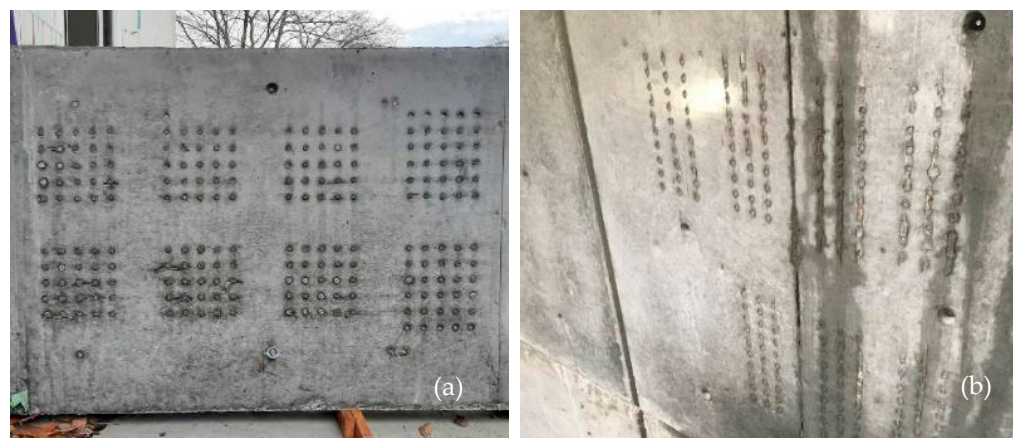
Surface of concrete after demolding (a) mock-up specimen (b) construction site.
